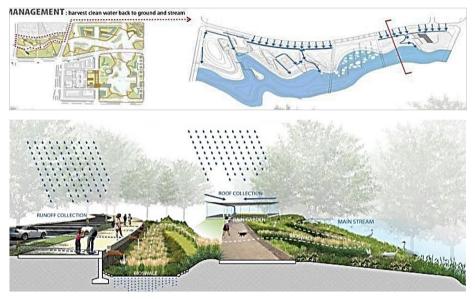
Example of landscape drainage and water storage structure of Ningbo Ecological corridor, Ningbo, China: site plan (above) and section (below).
